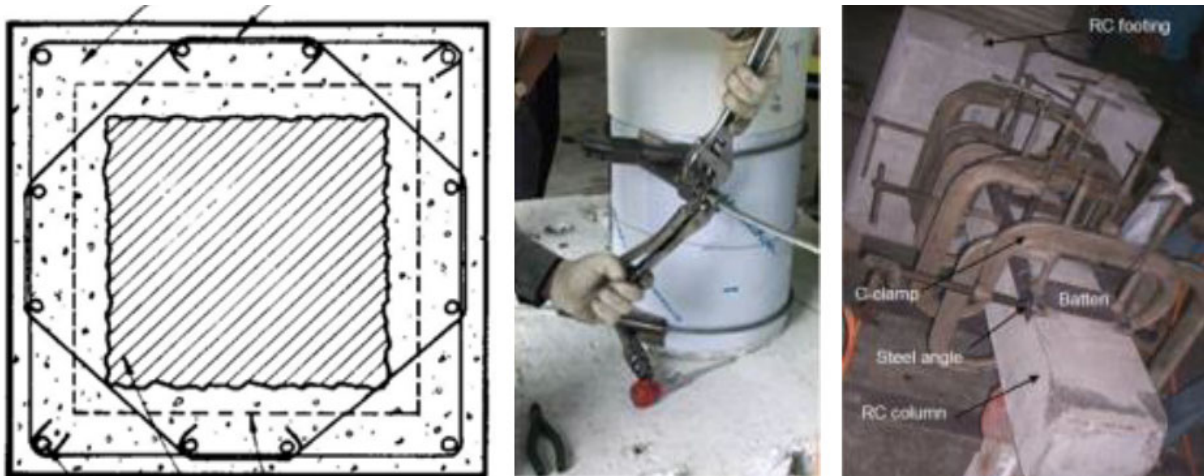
Cross-Section of Reinforced Concrete Jacket; Steel Wrapping; Installation of Steel Cage. [\(Islam & Hoque 2017, p. 6\)](#)
